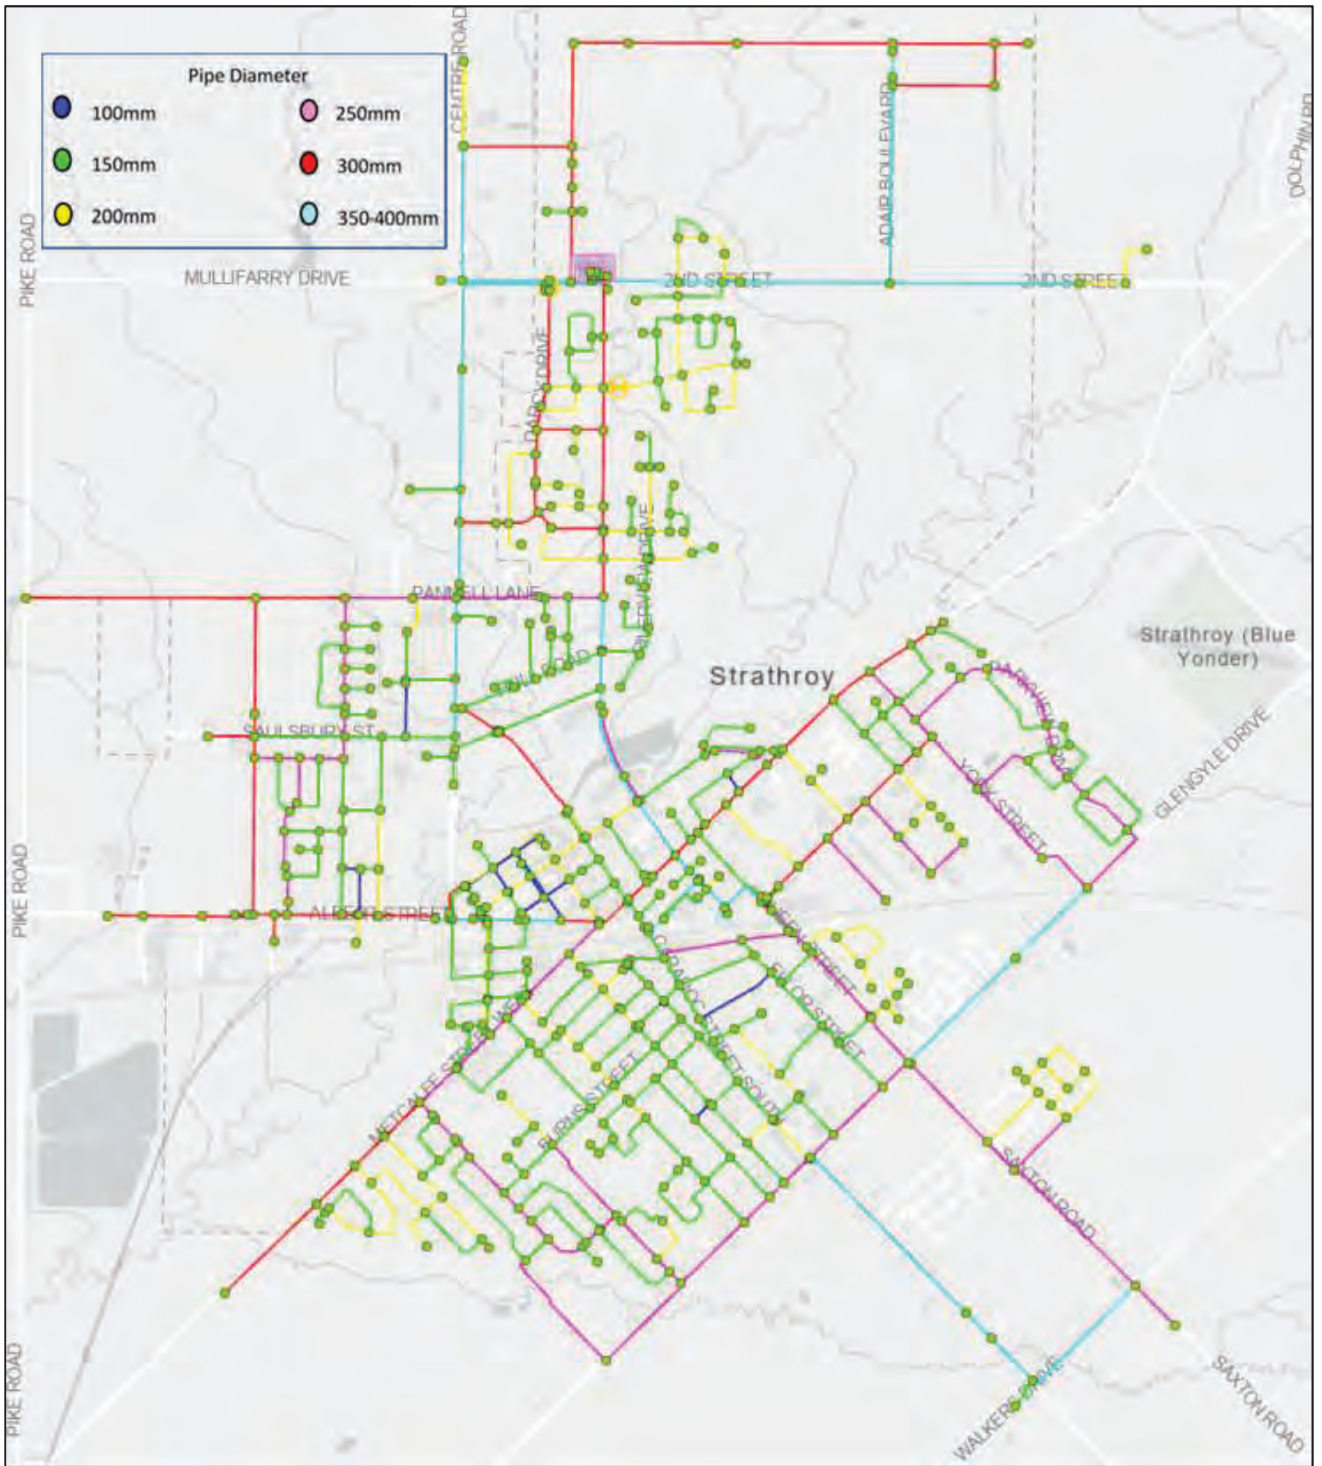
Proposed Watermain System Layout with Pipe Diameters
